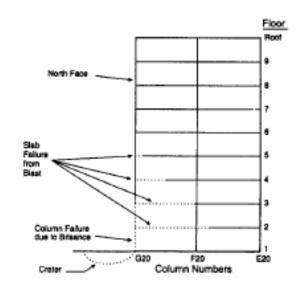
Cross Section of Nine Story Portion of Murrah Building Showing Blast Response of the Slab. [20]
